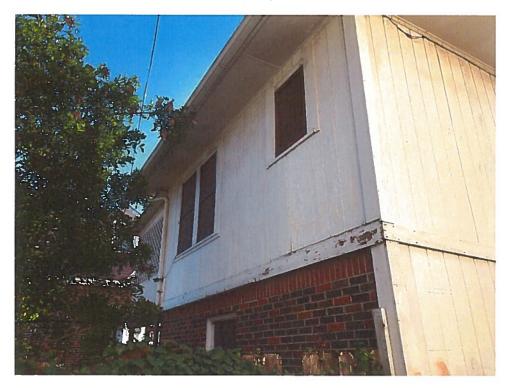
Rear of garage apartment along alley behind 240/242 West Huisache.
